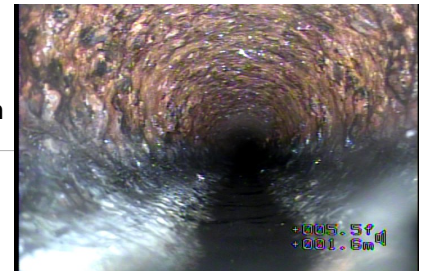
A view to the Roughness in the pipe walls and grease at 5.6 meters from the top of HALLWAY FLOOR CO.
